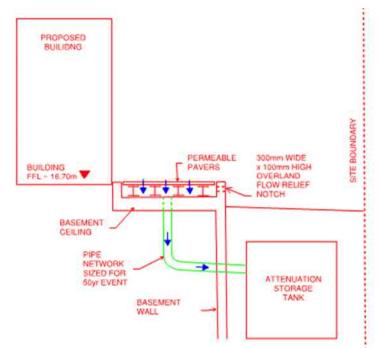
Site 1 Bishopspark Typical Cross-section of Stormwater Overland Flow Philosophy
